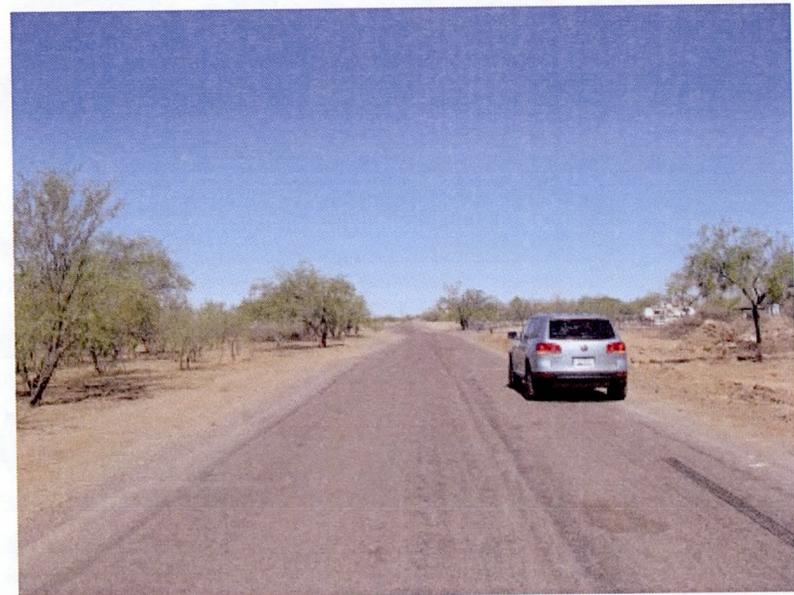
At intersection of Norwich Drive and Beacon Field Blvd looking west along Norwich Drive.
